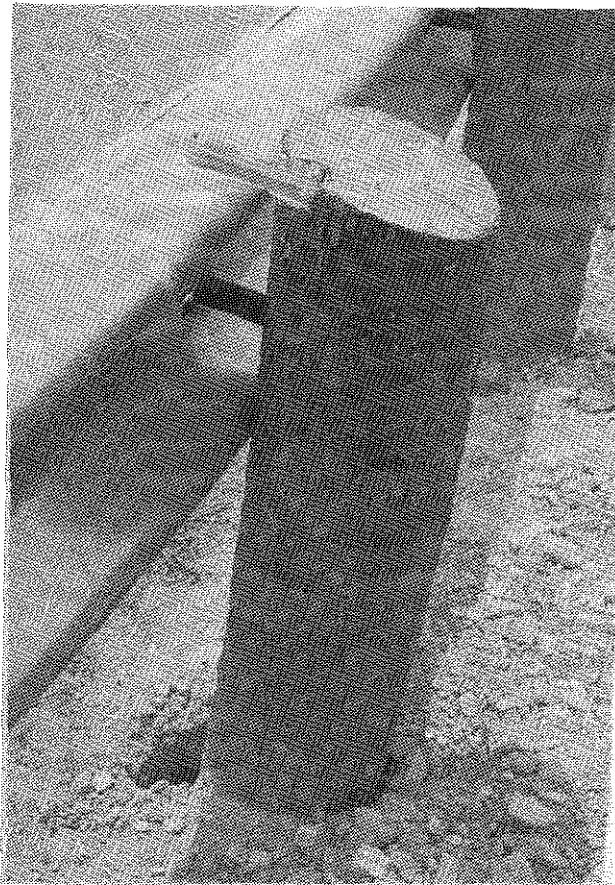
EVIDENCE OF SNAGGING ON POSTS AND CONCRETE WALL
